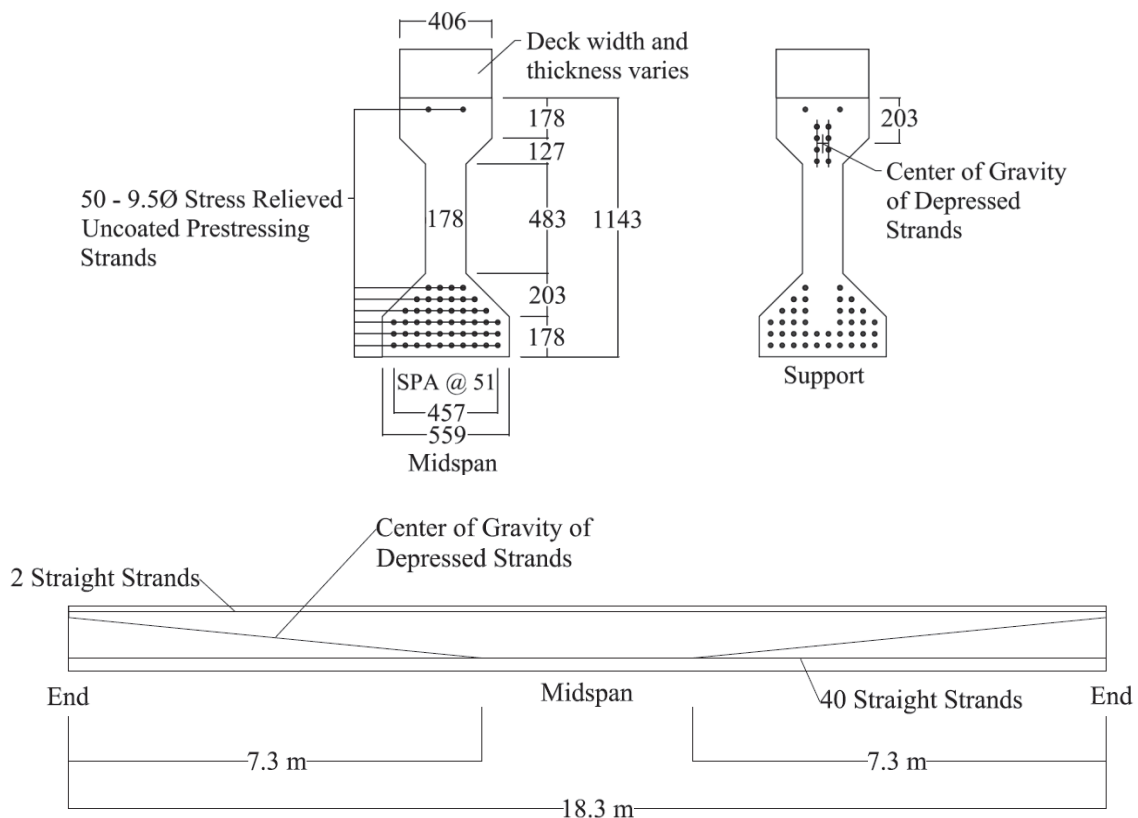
AASHTO Type III Girder Dimensions and Prestressing Details
